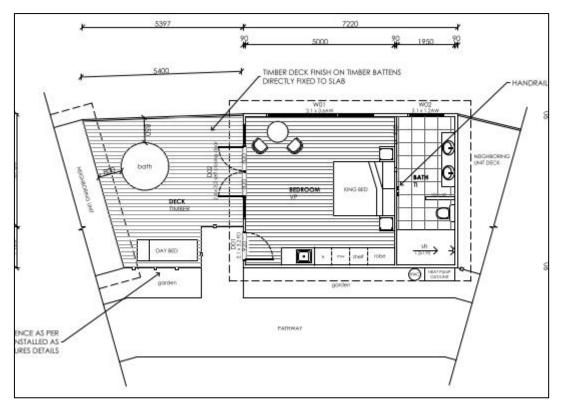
Units 2-5 - floor plan (Source: RFS Projects)
